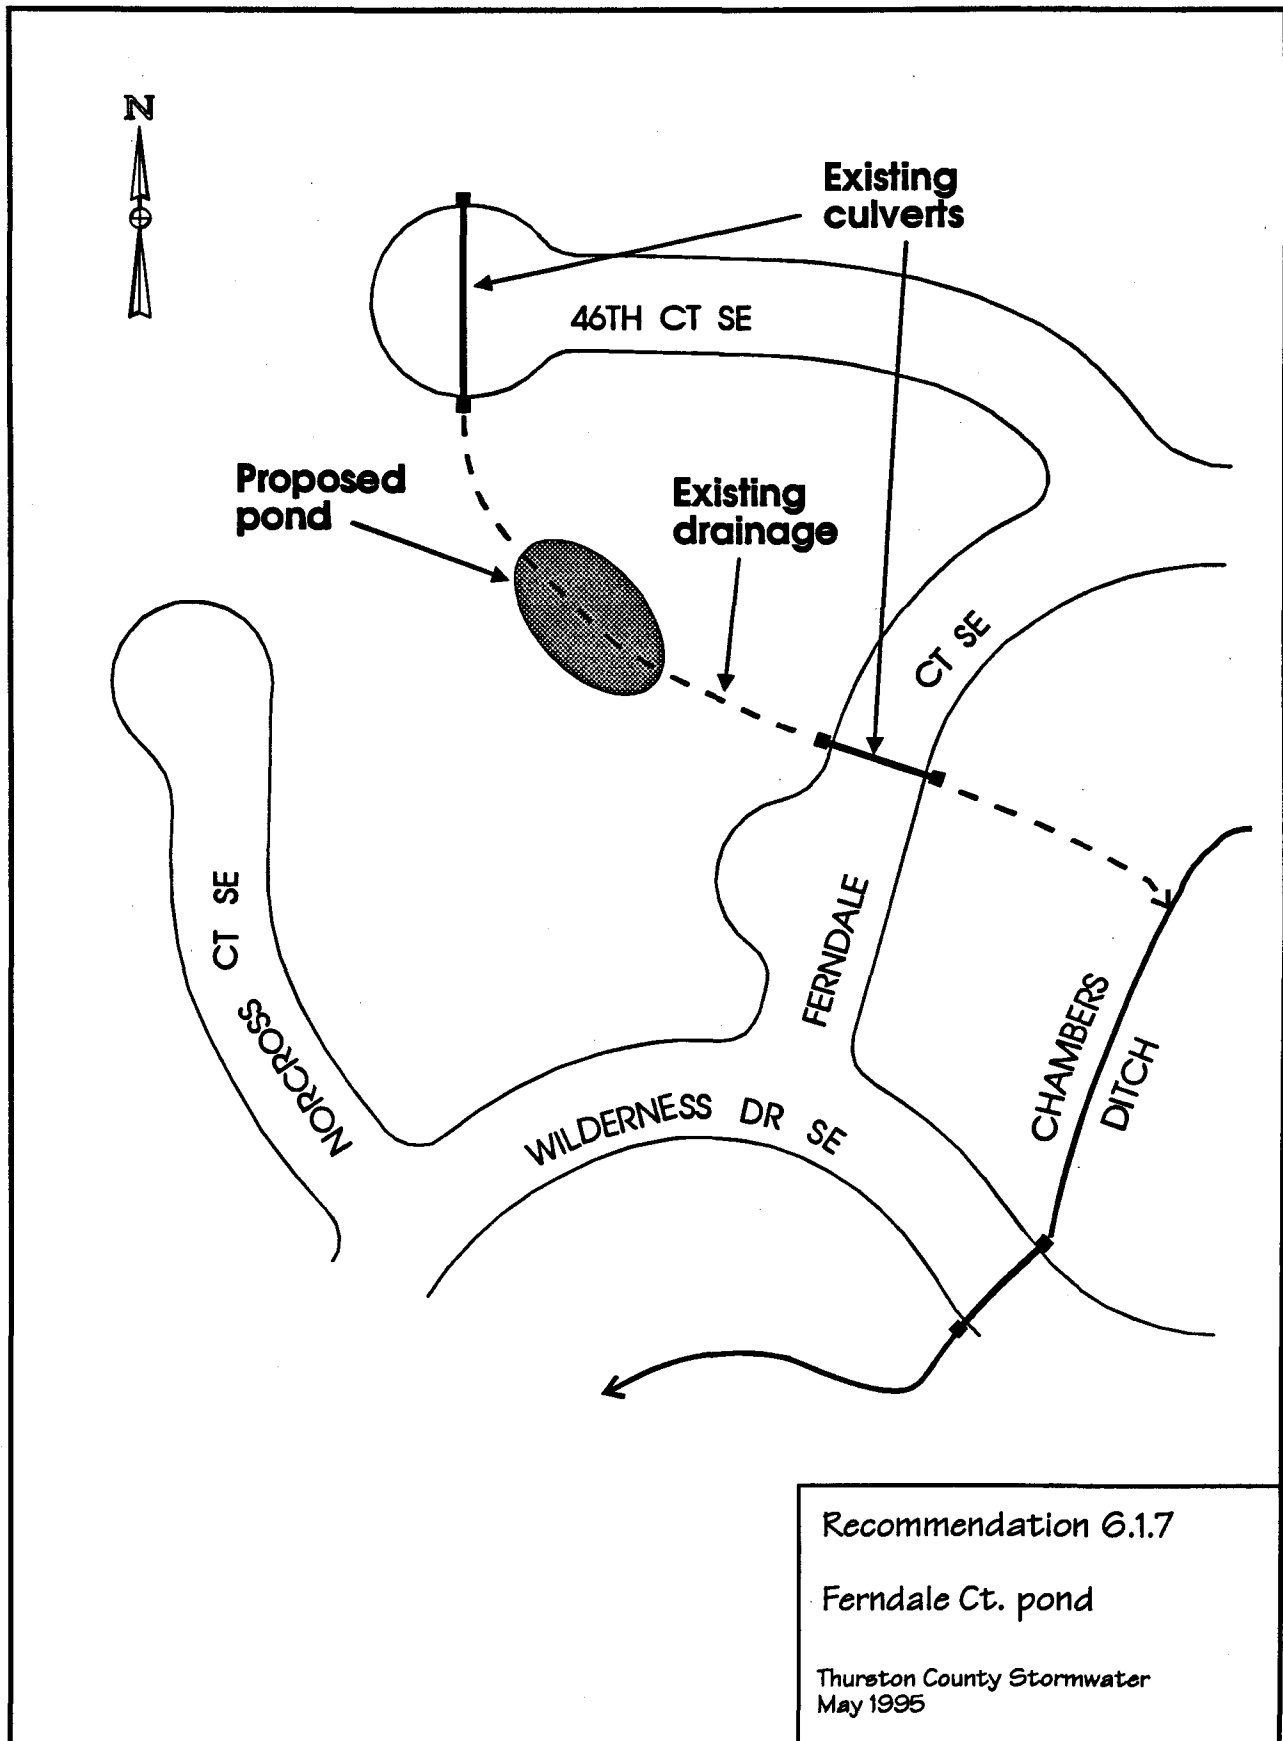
Proposed Ferndale Court stormwater detention pond
